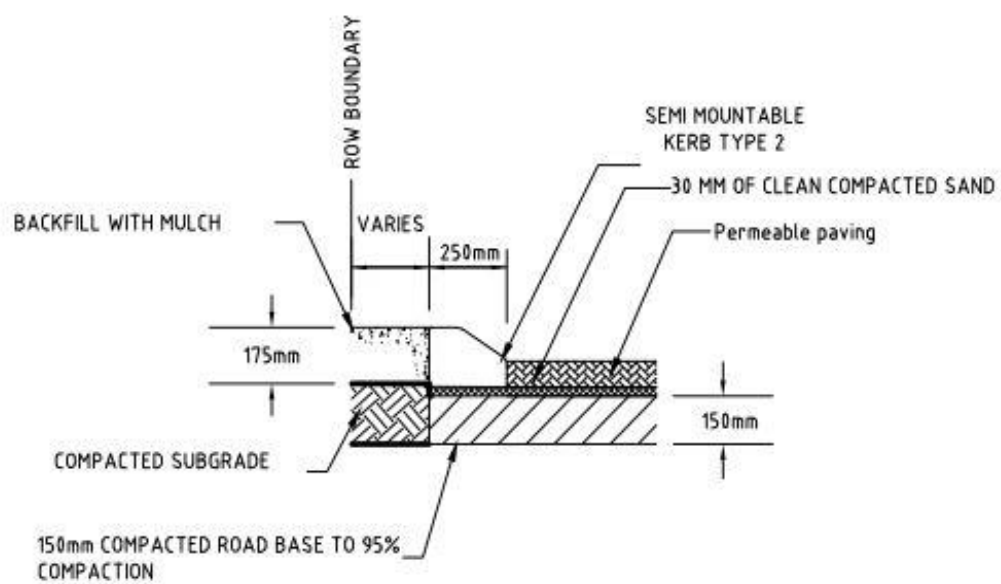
DETAILS OF INDIVIDUAL RIGHTS OF WAY
